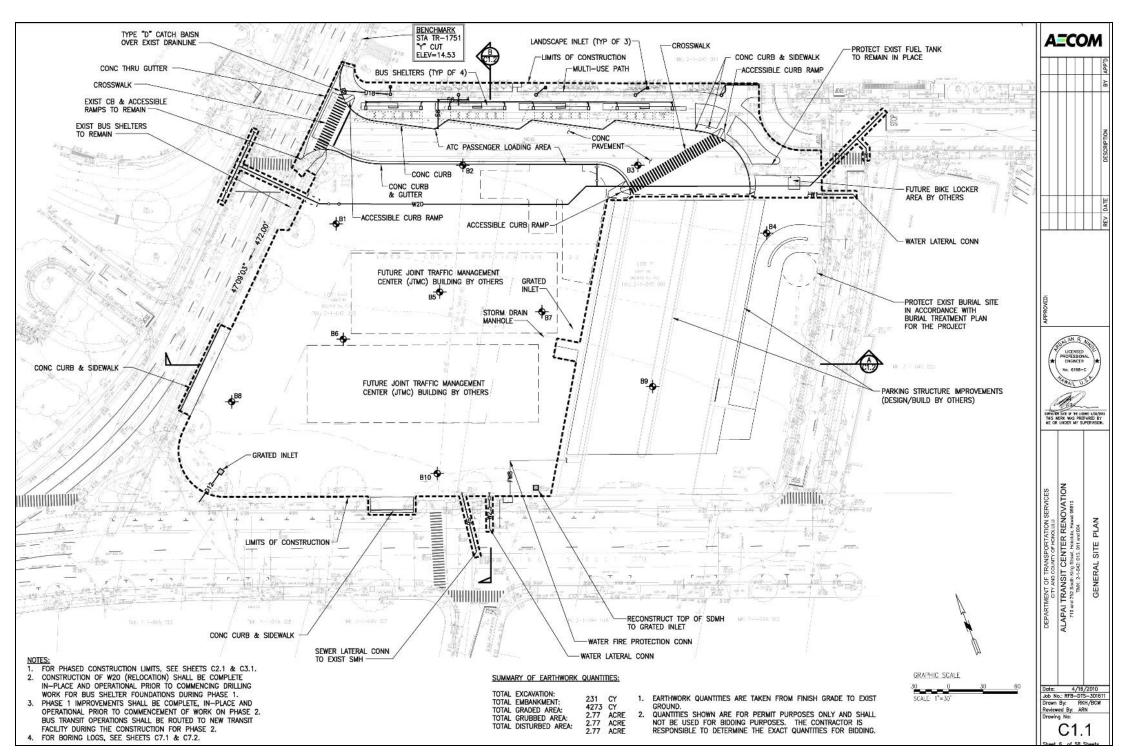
Project area plans showing the plans for the ATC renovation. Note the burial preserve area, a circle depicting a 30' buffer area located immediately makai of the Kealamakai Street parking structure ramp
